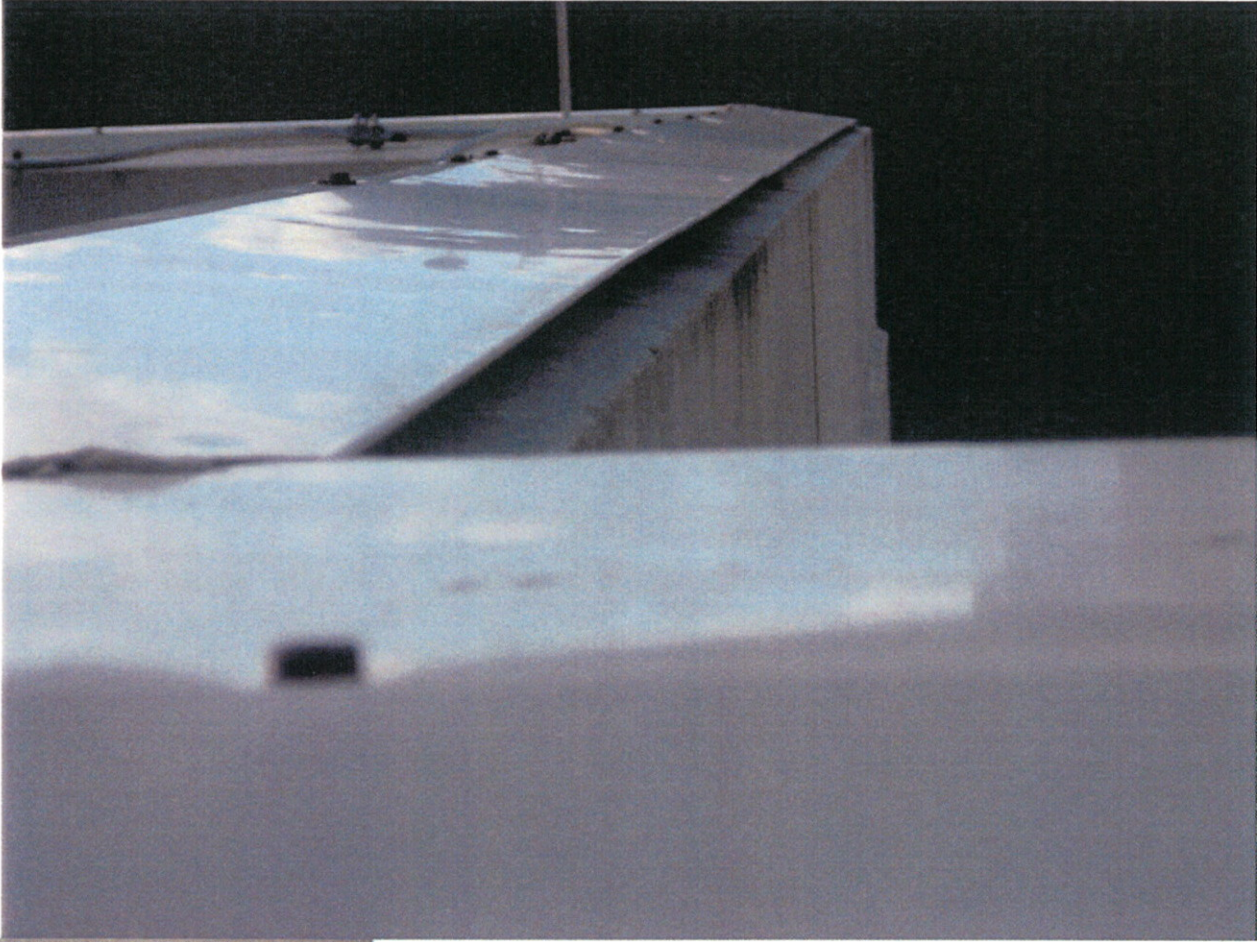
PARAPET SHEETMETAL GAP
